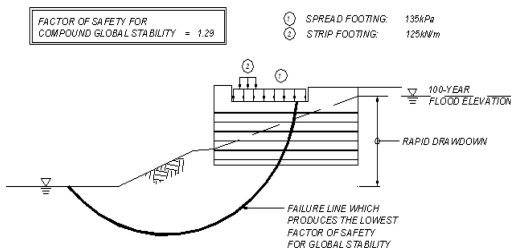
Example of calculated failure mode for compound global stability – Case 5, dam breach.
